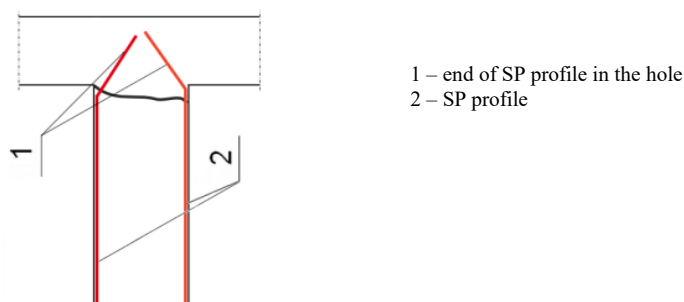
Scheme of reinforcement and stabilization of the partition wall with Saver profiles
